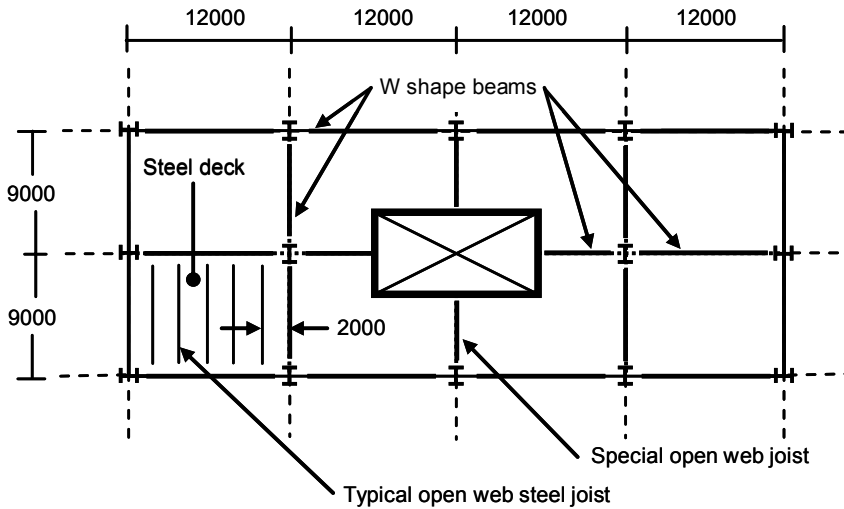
Floor assembly specified at the element level, alternative # 2 (dimensions in mm)
